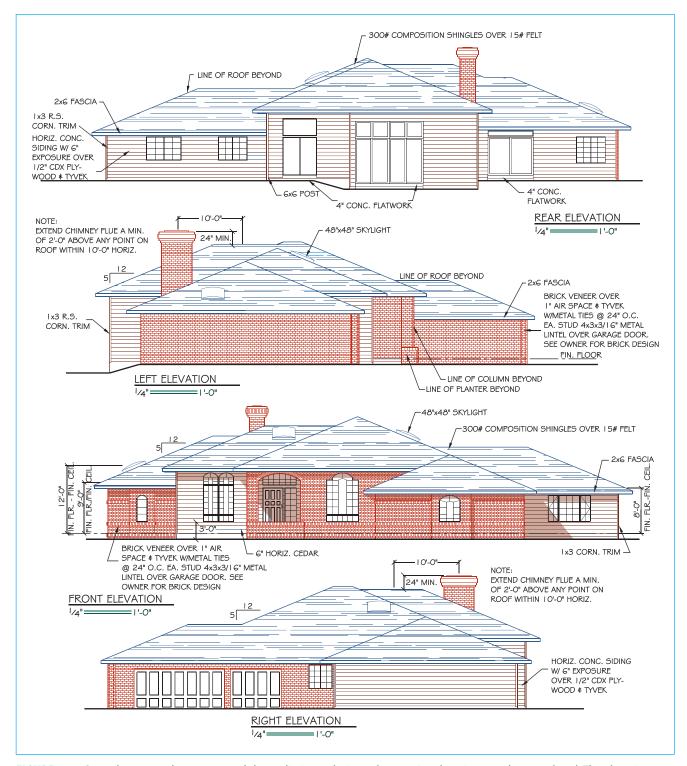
Once the owners have approved the preliminary designs, the exterior elevations can be completed. The elevations will provide a view of each side of the structure and show and specify all exterior materials to be used.
